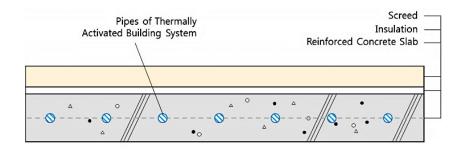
Section view of the thermally activated building system (TABS) Source: Chung, W.J. et.al, 2017
